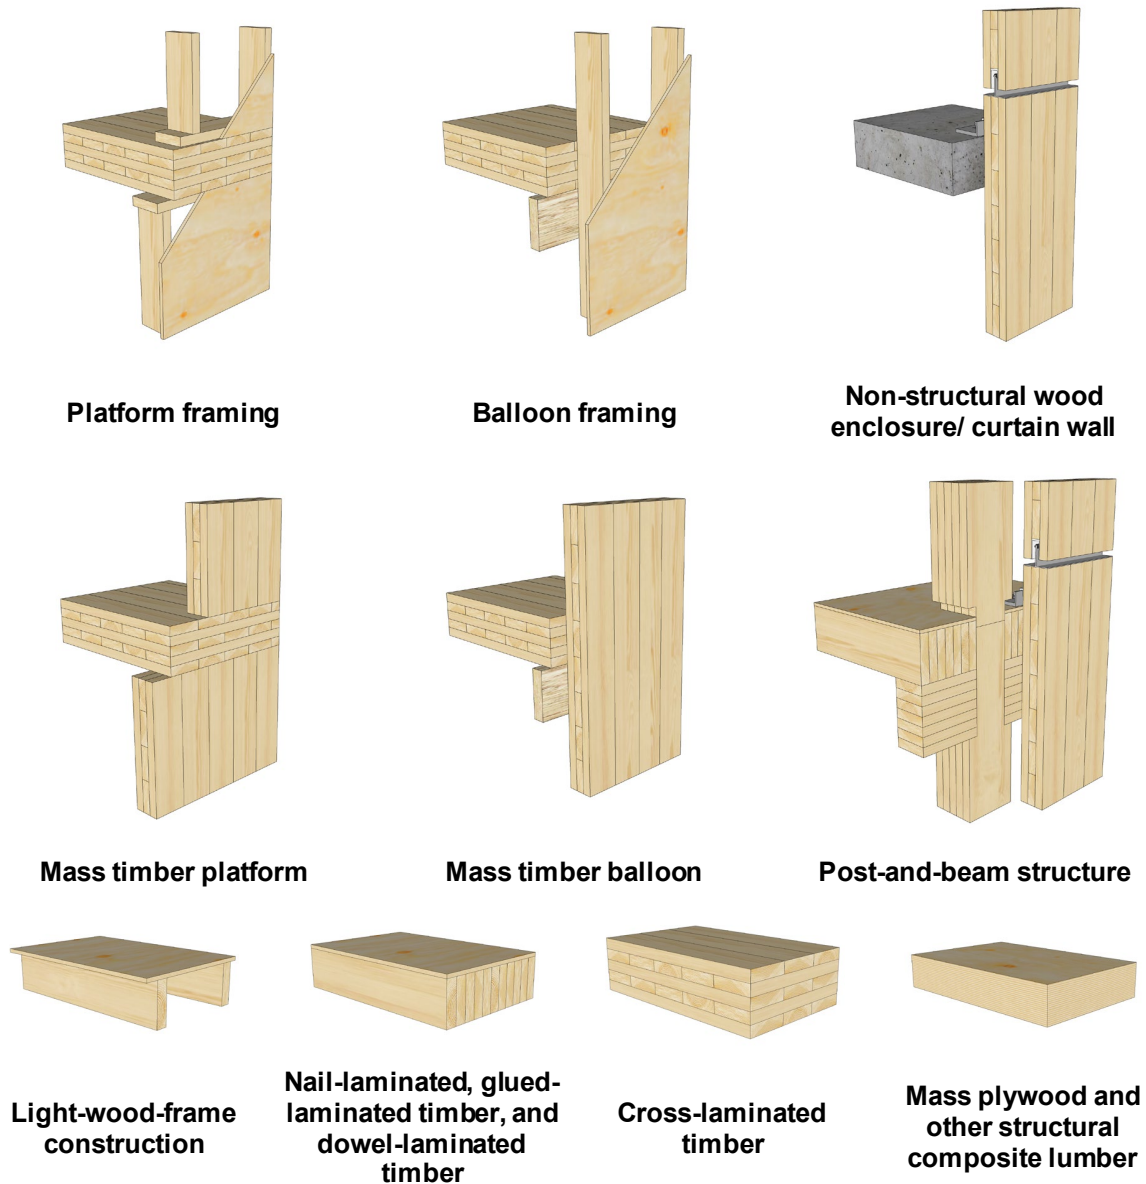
Examples of structural and exterior wall and roof systems that use wood components.
